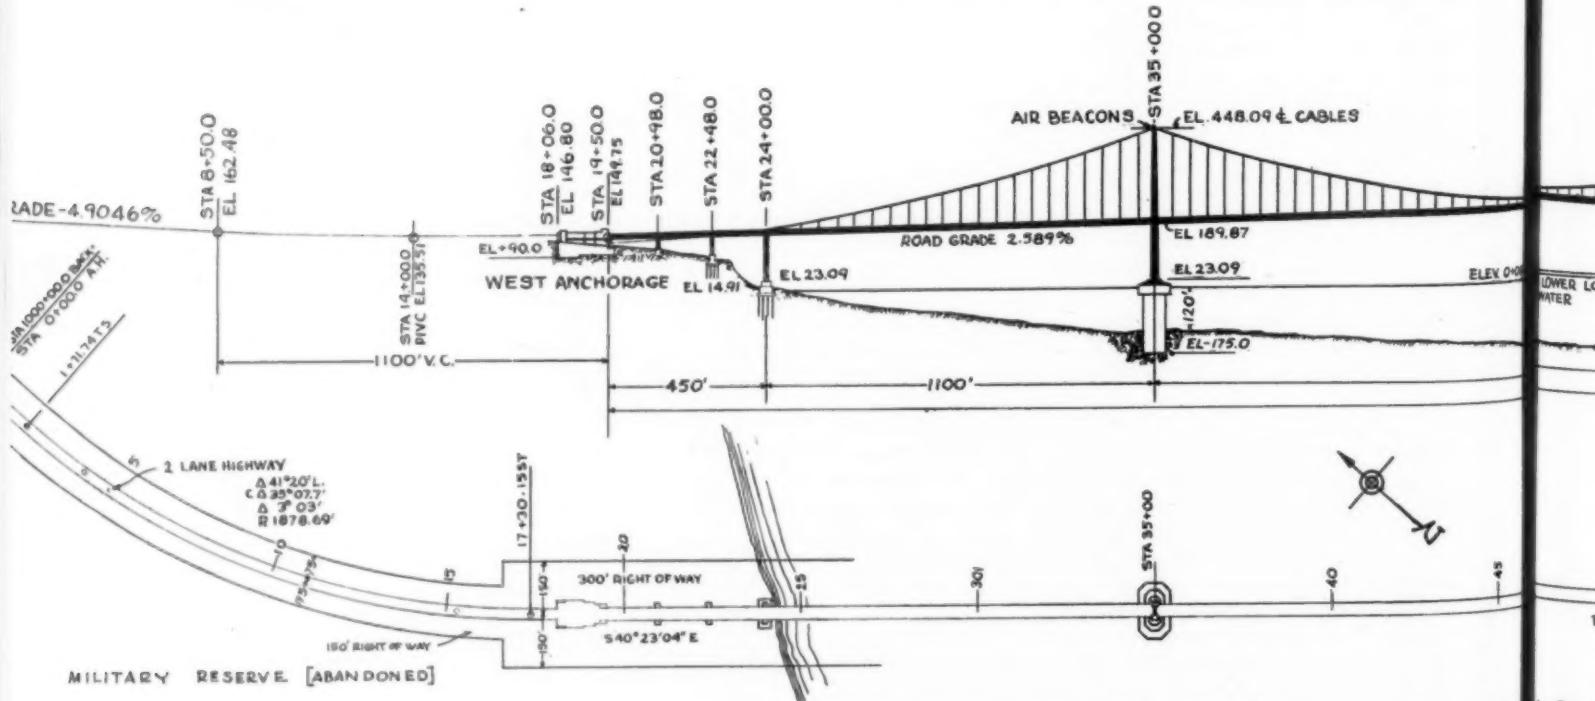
Plan and profile of the Tacoma Narrows Suspension Bridge. Center
